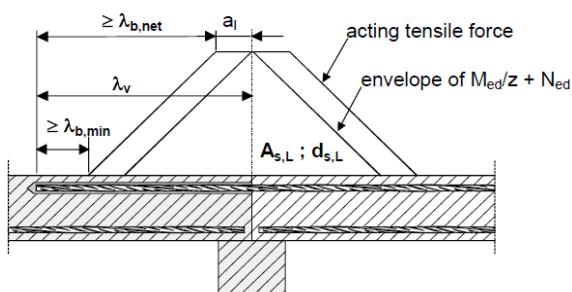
Anchoring of reinforcement to cover the line of acting tensile force
